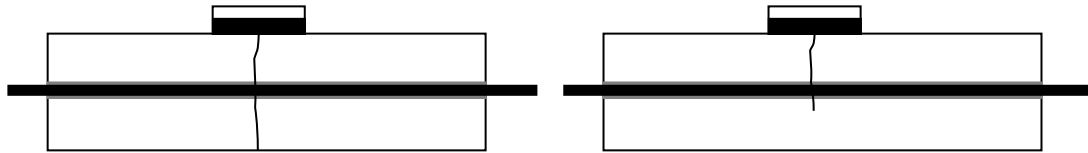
(a) Through crack specimen, and (b) flexure crack specimen
